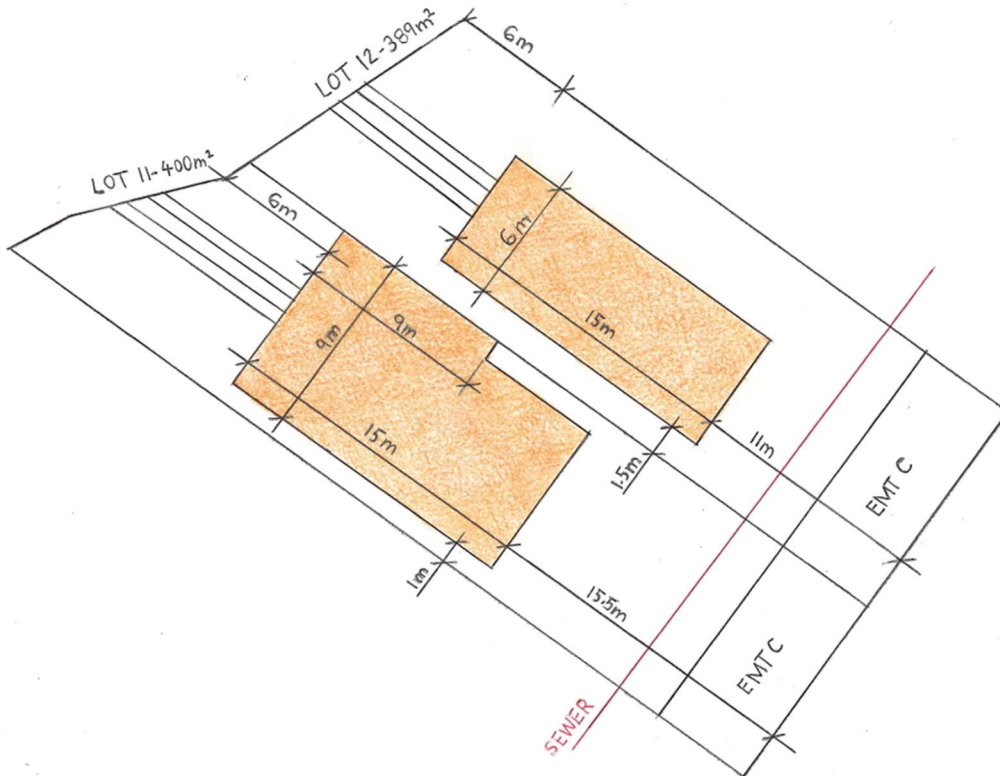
Detached Dwelling house sizes as per Subdivision code requirements
